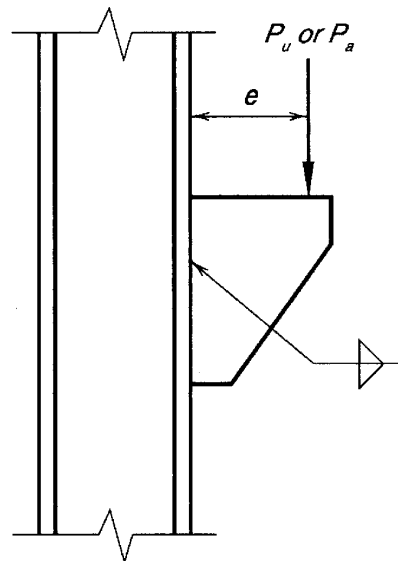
Welds subject to eccentricity normal to the plane of the faying surface.
